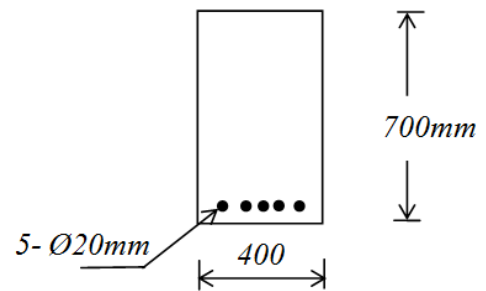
Spacing between the vertical longitudinal reinforcements.
